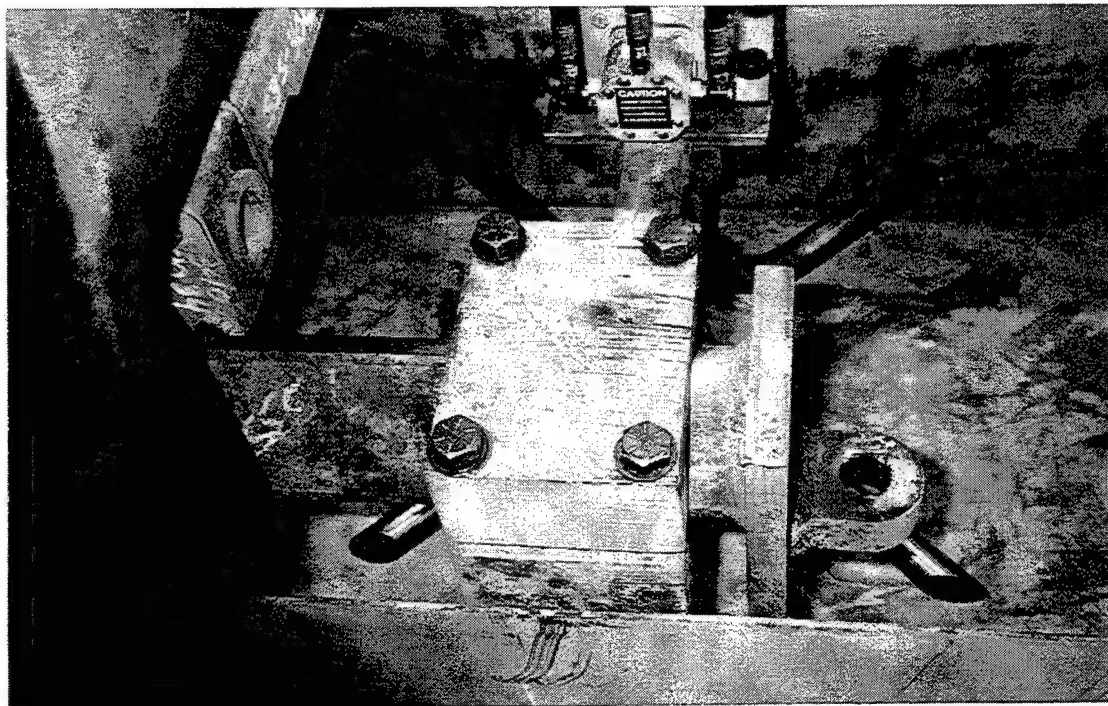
Rigid bar for mounting mechanism onto slipform pavers
